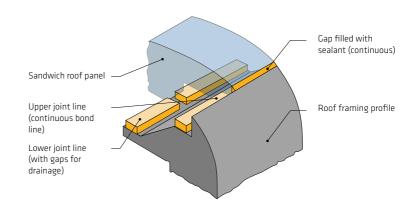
Example of how to prevent water ingress in a roof panel joint
